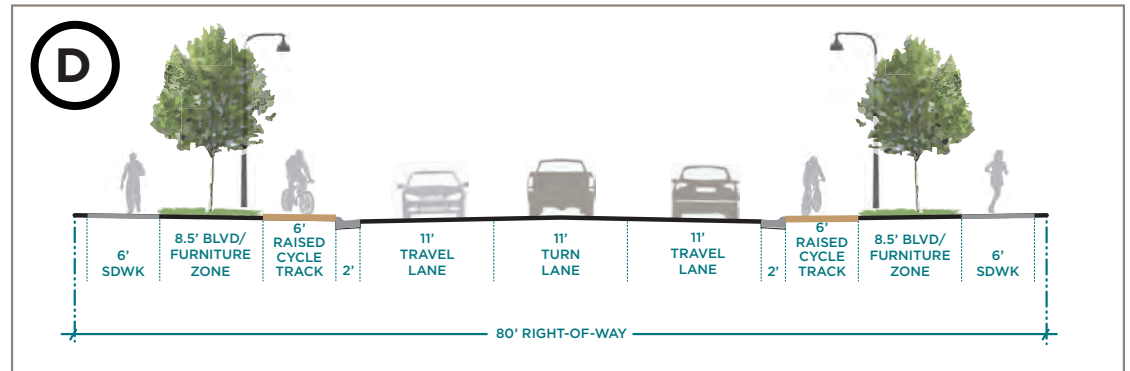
Preferred Alternative East Missoula Typical Section Looking East
